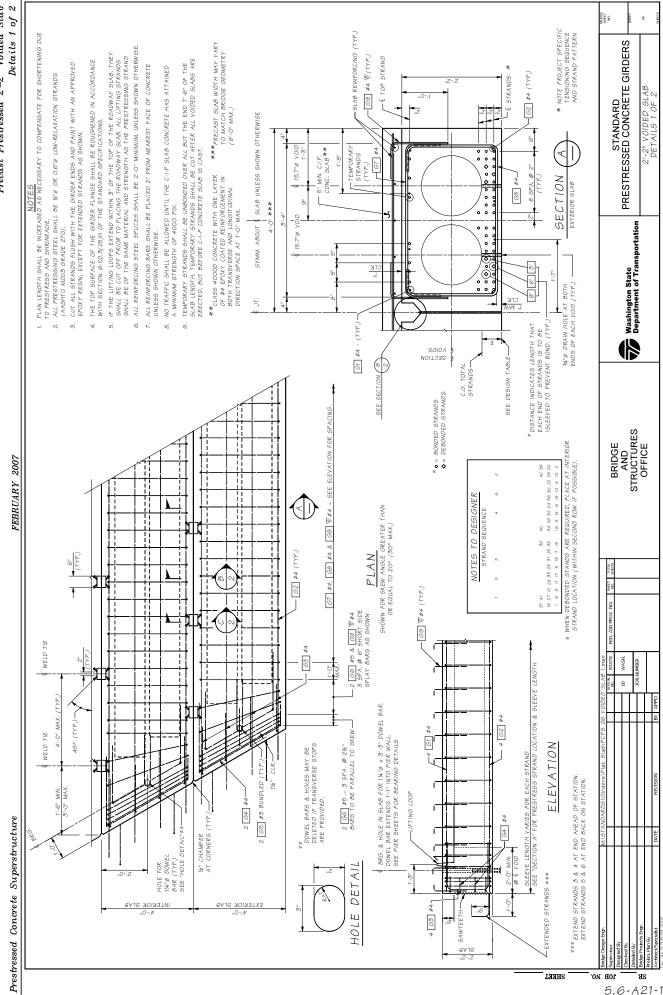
of 2 -SLAB REINFORCING (TYP.) PRECAST SLAB WIDTH MAY VARY TO MATCH BRIDGE GEOMETRY (8'-0" MAX.) NOTES PLAN LENGTH SHALL BE INCREASED AS NECESSARY TO COMPENSATE FOR SHORTENING DUE TO PRESTRESS AND SHRINKAGE. - G9 V #4 (TYP.) PRESTRESSED CONCRETE GIRDERS - (E TOP STRAND) 6. ALL REINFORCING STEEL SPLICES SHALL BE 2'-O" MINIMUM, UNLESS SHOWN OTHERWISE. - E STRANDS IF THE LIFTING LODPS EXTEND WITHIN 3" OF THE TOP OF THE ROADWAY SLAB, THEY SHALL BE CUT OF PRING Y PLANGO THE ROADWAY SLAB. ALL LIFTING STRANDS SHALL BE OF THE SAME MATERIA, AND STRENGTH AS THE PRESTRESSING STRAND. TEMPORAY STRANDS SHALL BE UNRONNED DYER ALL BUT THE END 7"-G" OF THE SELB LENDTH, TEMPORAY STRANDS SHALL BE CUT AFTER ALL VOIDED SLABS ARE FEEFERD, BUT BEFORE G"+P CONCETTE SLAB IS CAST. - G2 #4 (TYP.) THE TOP SURFACE OF THE GIRDER FLANGE SHALL BE ROUGHENED IN ACCORDANCE WITH SECTION 6-02.3(25)H OF THE STANDARD SPECIFICATIONS. CUT ALL STRANDS FLUSH WITH THE GIRDER ENDS AND PAINT WITH AN APPROVED EPOXY RESIN, EXCEPT FOR EXTENDED STRANDS AS SHOWN. ALL REINFORCING BARS SHALL BE PLACED 2" FROM NEAREST FACE OF CONCRETE UNLESS SHOWN OTHERWISE. NO TRAFFIC SHALL BE ALLOWED UNTIL THE C-I-P SLAB CONCRETE HAS ATTAINED A MINIMUM STRENGTH OF 4000 PSI. 2. ALL PRESTRESSING STEEL SHALL BE 12"0 OR O.G"0 LOW-RELAXATION STRANDS (AASHTO MZOS GRADE 270). SYMM. ABOUT & SLAB UNLESS SHOWN OTHERWISE TEMPORARY STRANDS (TYP.) -5" MIN. C.I.P. 9"B VO CONC. SLAB \*\*\* 68 #4 3"B VOID SECTION \*\*\* EXTERIOR SLAB Washington State
